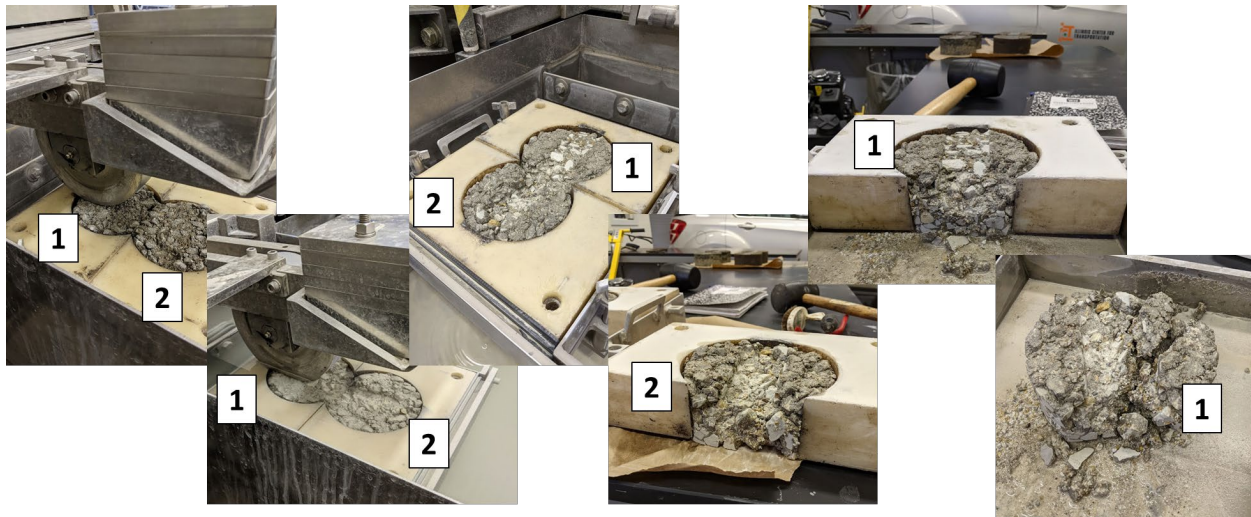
Photos. CAM II Hamburg wheel-tracking device (HWTD) testing shakedown specimens process during testing.
